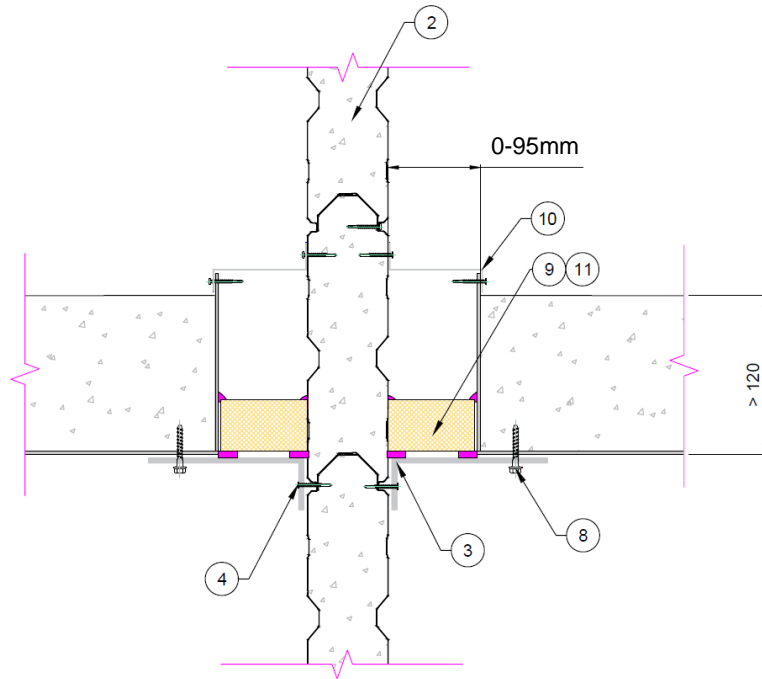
Wall-to-stair Joint (0-95 mm gap)
